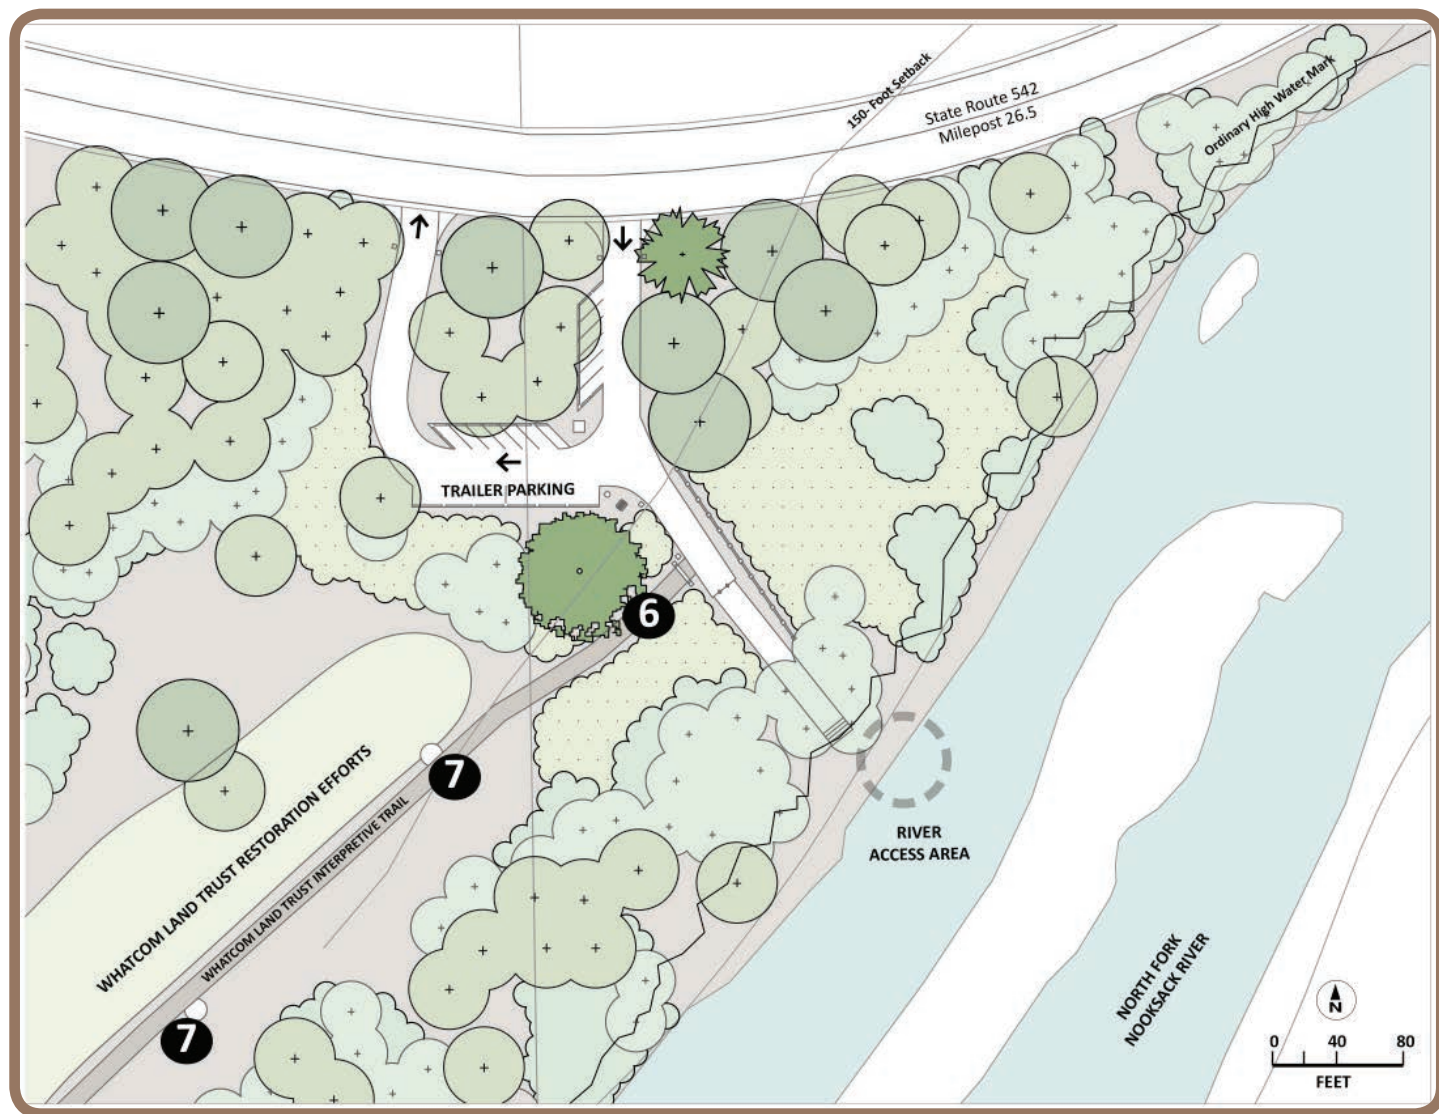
Whatcom Land Trust connections. Credit: Brianna Truden.
